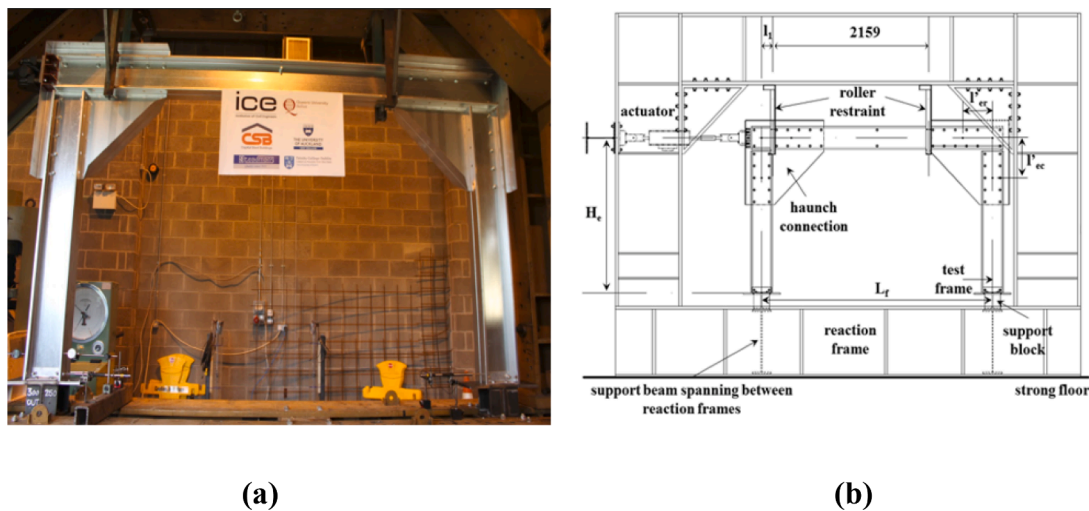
Test set-up; (a) photograph of C25020 frame prior to test; and (b) schematic drawing of the key dimensions.
